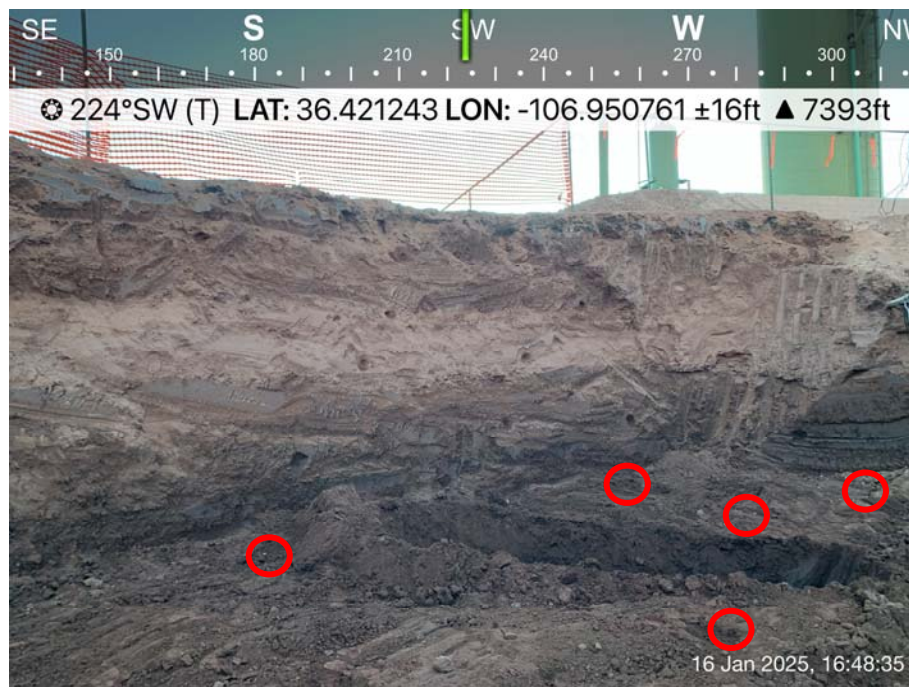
SS18 collected as a five-point composite sample from southwest base of excavation.
